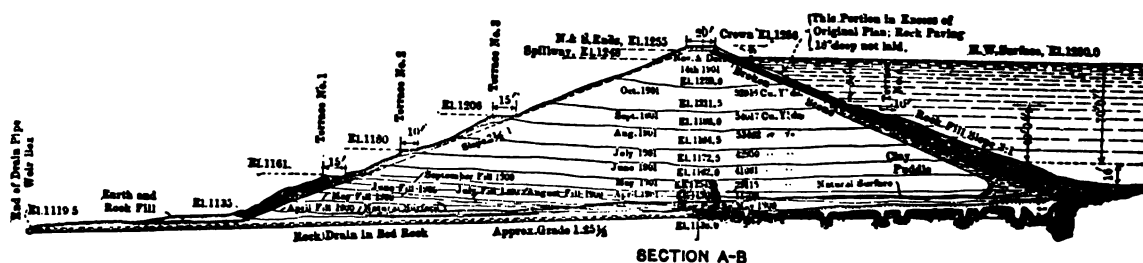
CROSS-SECTION OF TABEAUD DAM.
